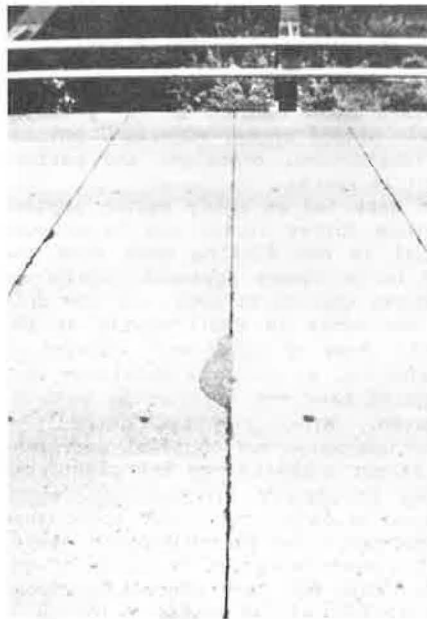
Knightstown deck was designed with built-in crown and with stirrups at ends of each slab to accommodate cast-in-place curb.
